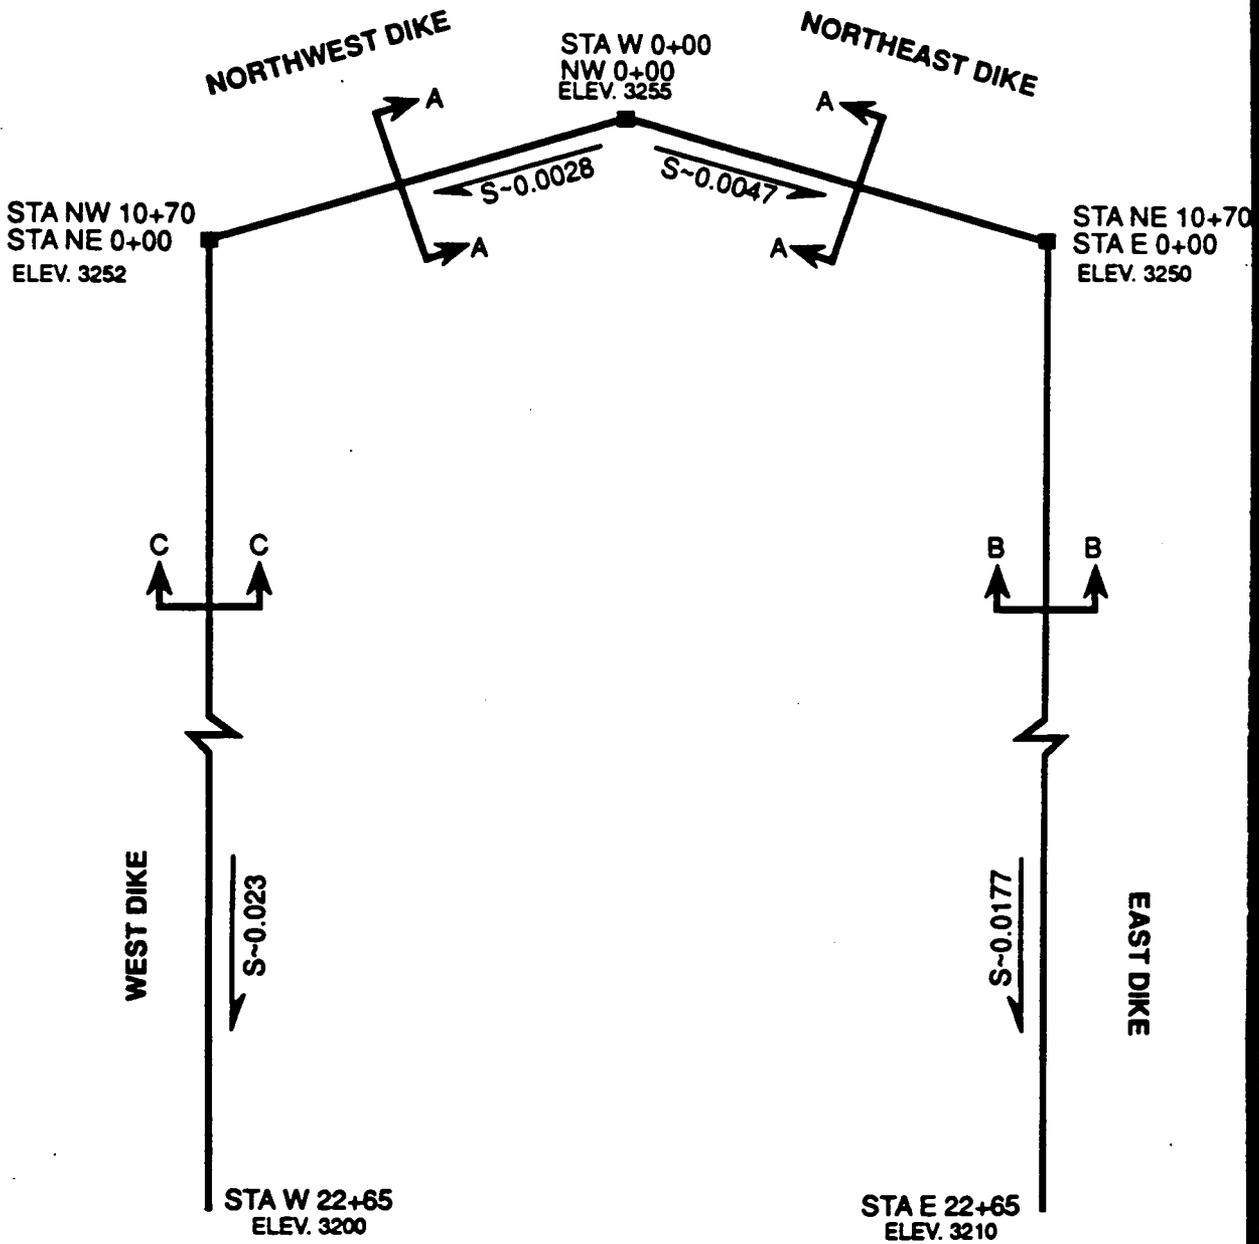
Schematic Layout for the Mixed Waste Disposal Unit Flood Protection System
